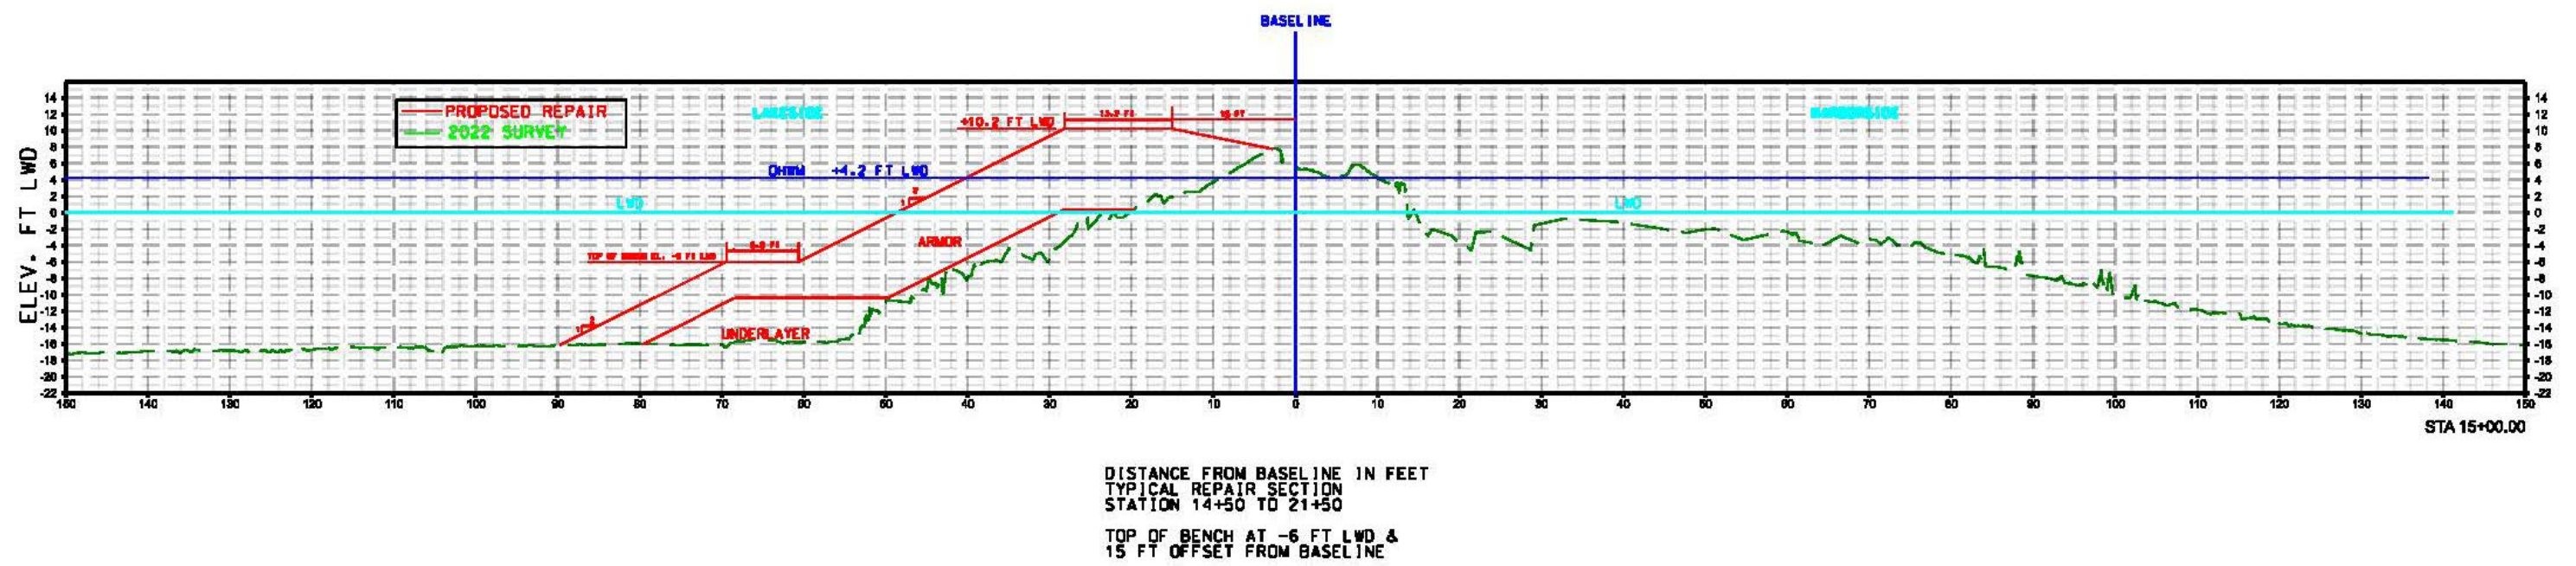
Typical Repair Section Station 14+50 to Station 21+50
